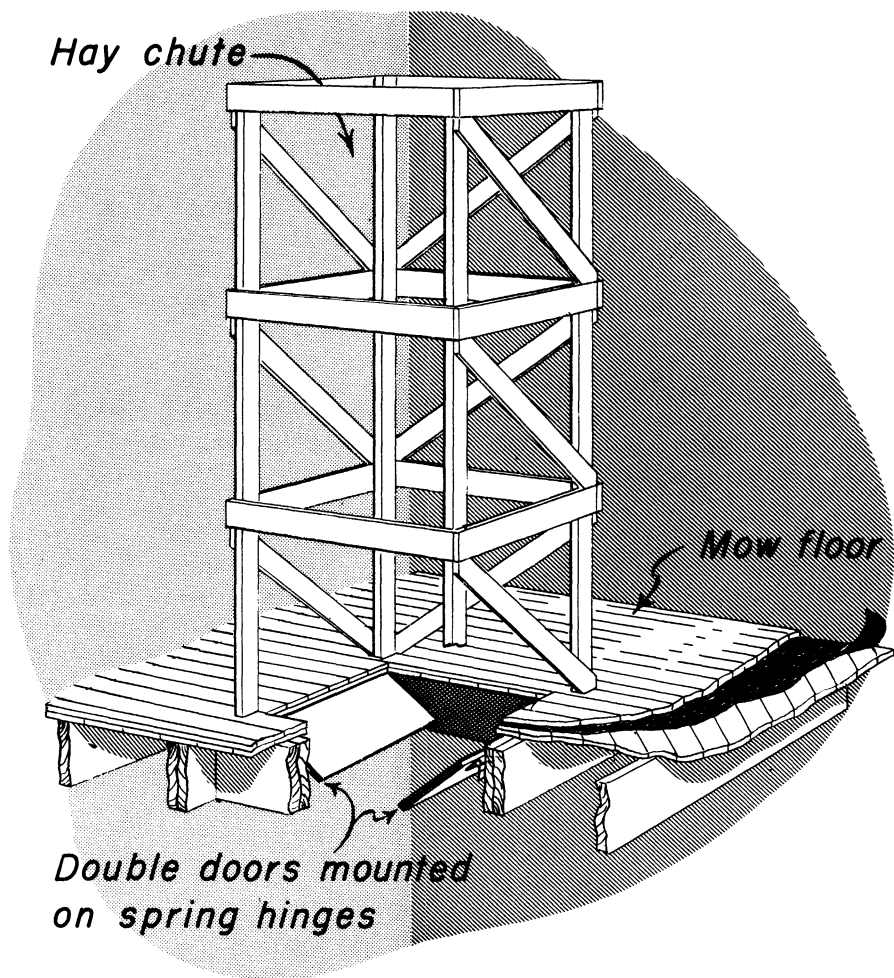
Circulation of air through hay chutes may be prevented by installing a trapdoor at the mow floor.
